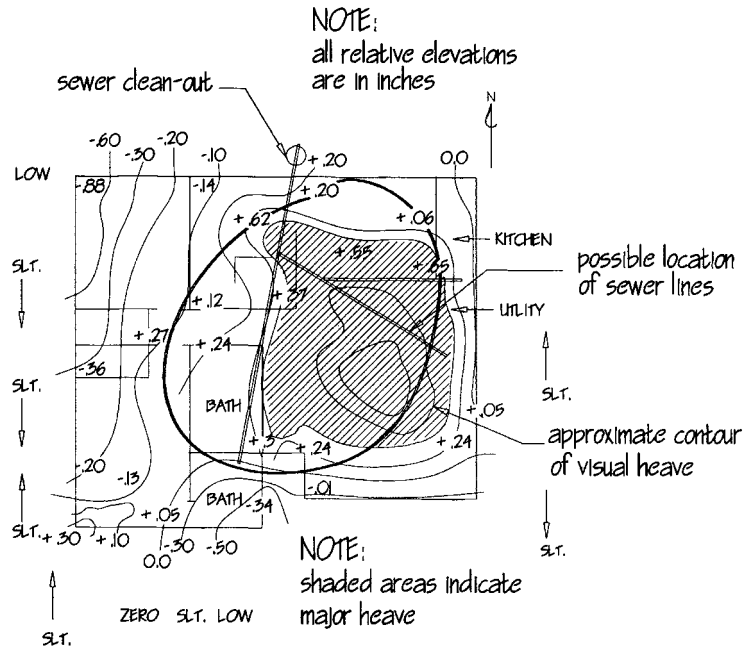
B.8.6. Differential elevations in a slab foundation.
